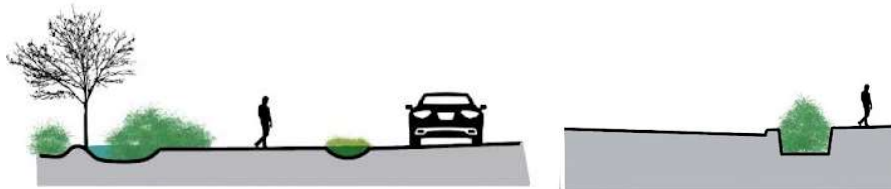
Typical Section of proposal of Green streets (Left) and Retention Alley (Right)
